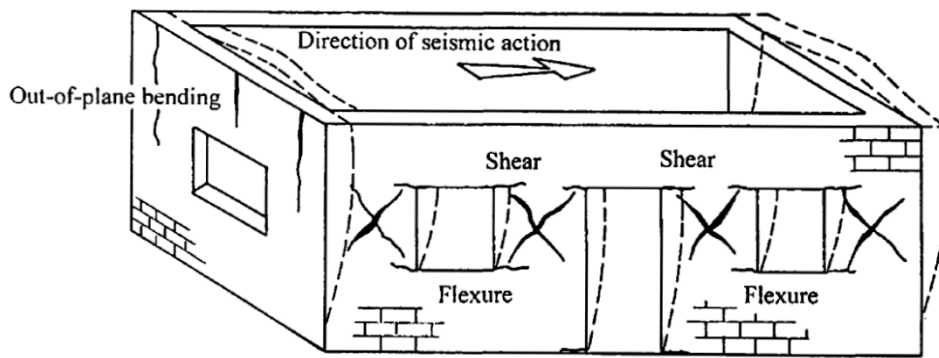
Deformation and typical damage on the load bearing walls (Tomažević, 1999)
